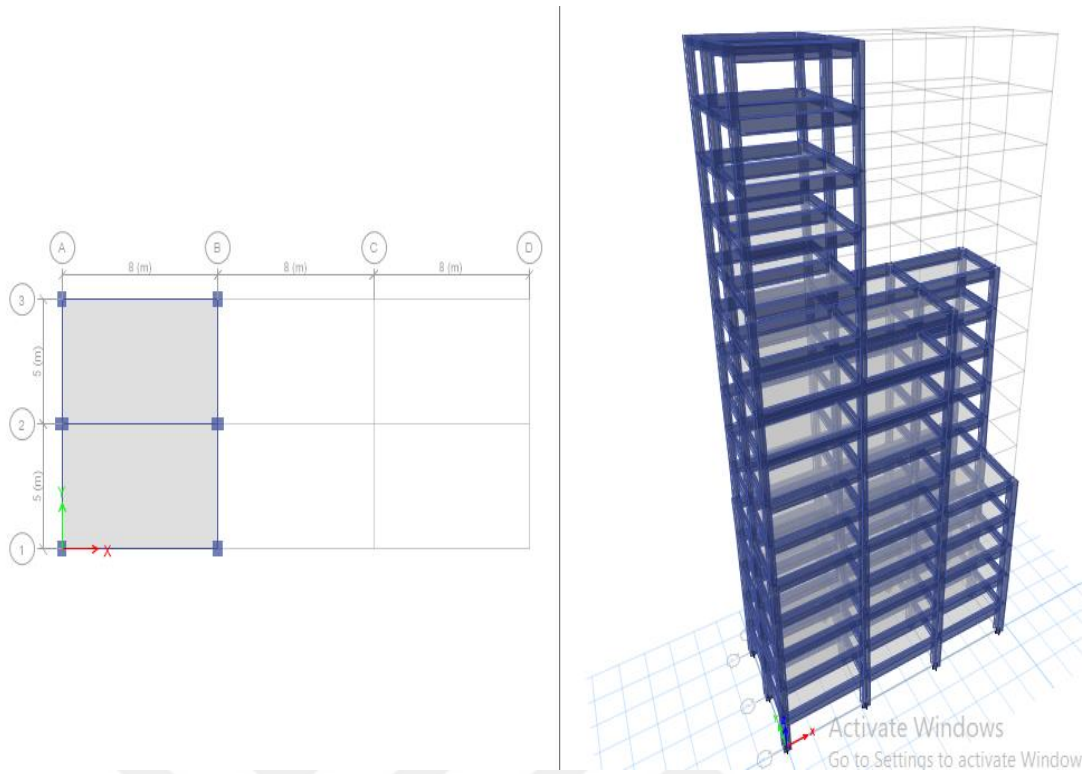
Eleventh to fifteenth story plan and 3D of 15 story irregular RCC building
